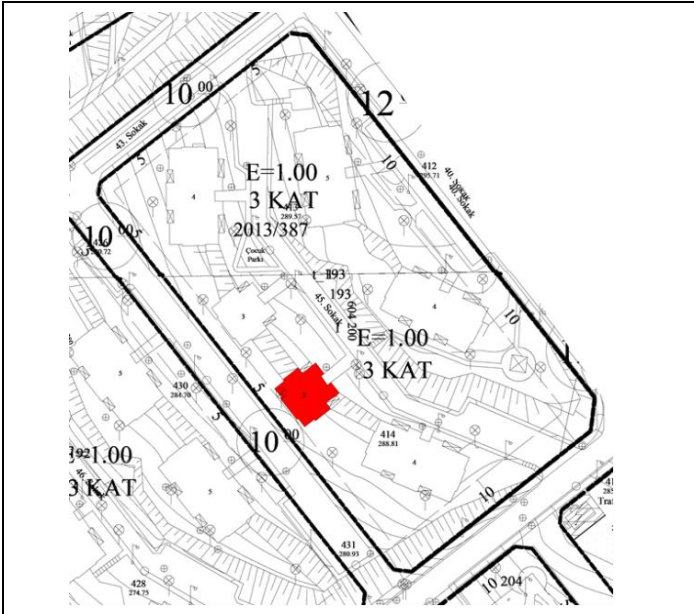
Type-1.1 The building was placed on the 193th island at 288 m elevation in northeast-southwest direction. The residence area is approximately 210 m<sup>2</sup> with three floors and a total of 6 apartments.
